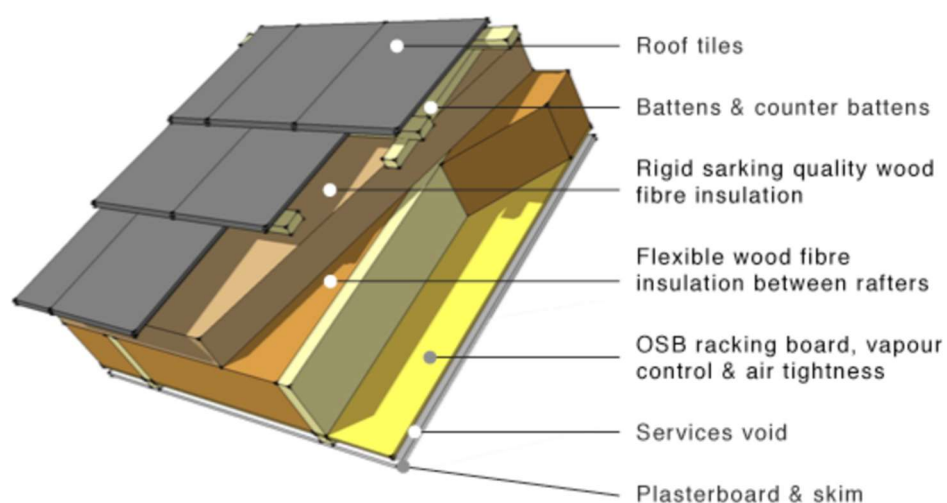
Flexible batts in new buildings roof. Source: Green Spec.
